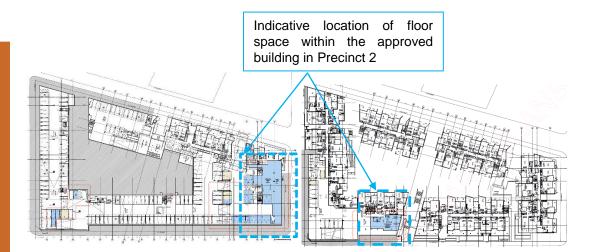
Indicative location of additional GFA located in the existing building. Level B2 (left) and Level 0 (right) (Source: Turner Architects)
